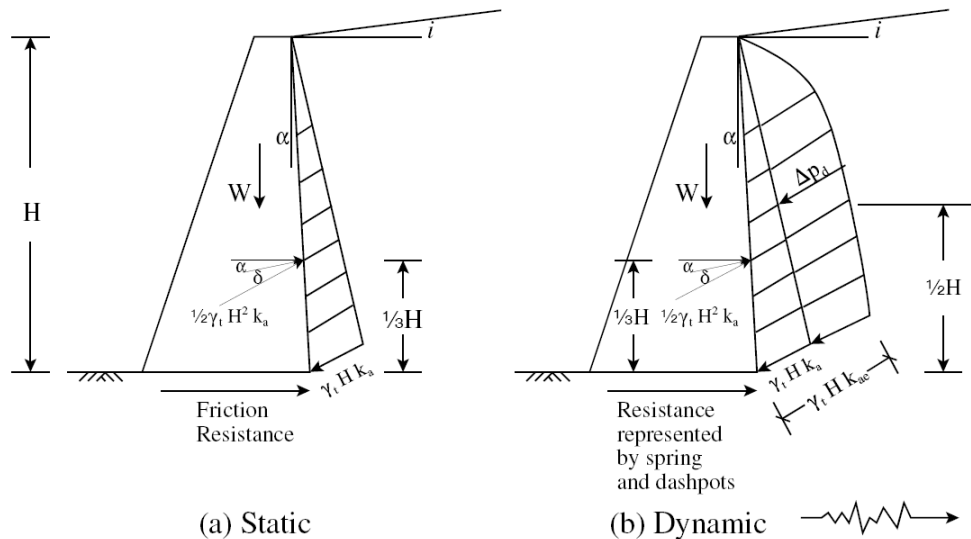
Force diagram of a wall with moist backfill and foundation soil subjected to a) static, and b) dynamic loading condition (Wu 1999)
